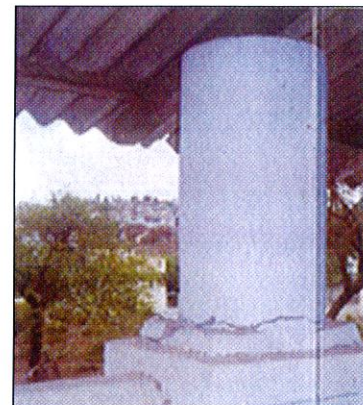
G2 Cracks (b) Column Base Shear Crack
